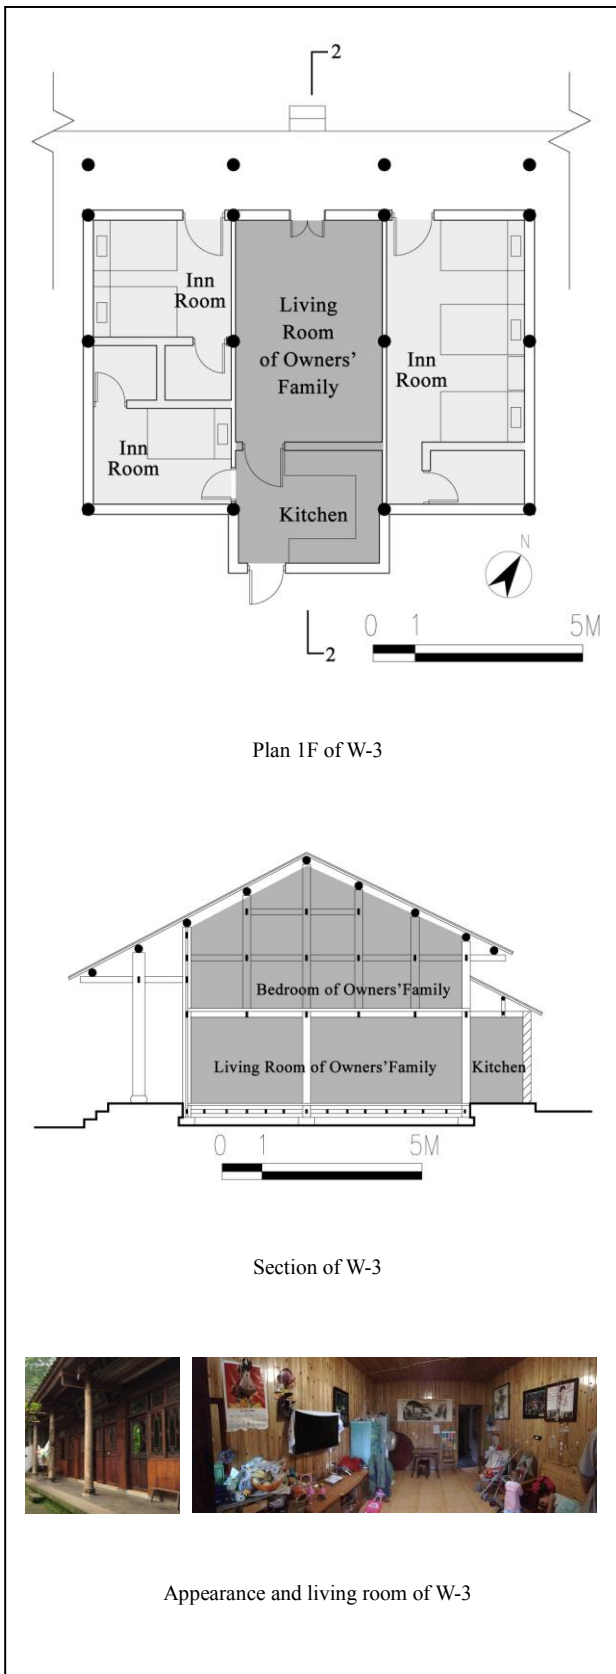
Building samples of wooden buildings (W)W-3 and wooden-brick building (WB)
